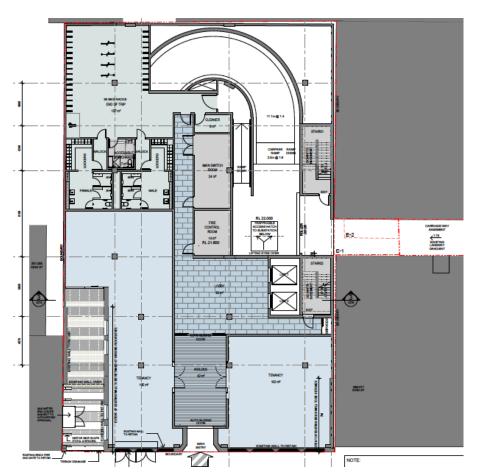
Proposed Ground Level Plan. From Drawing S101
